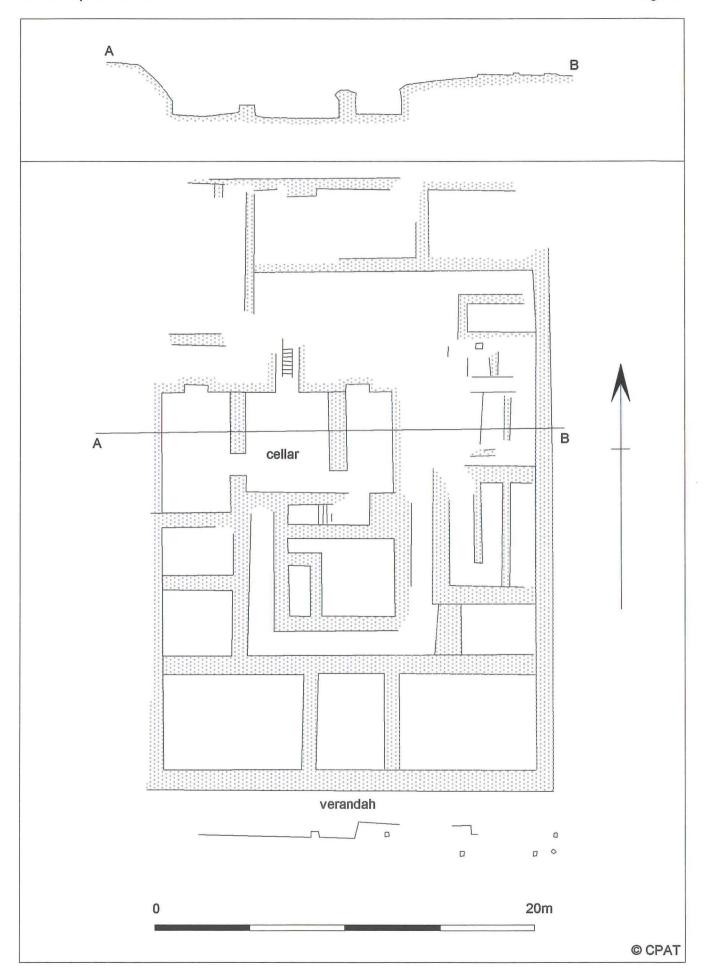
Ty Mawr (Nantyglo House) ground plan and section
